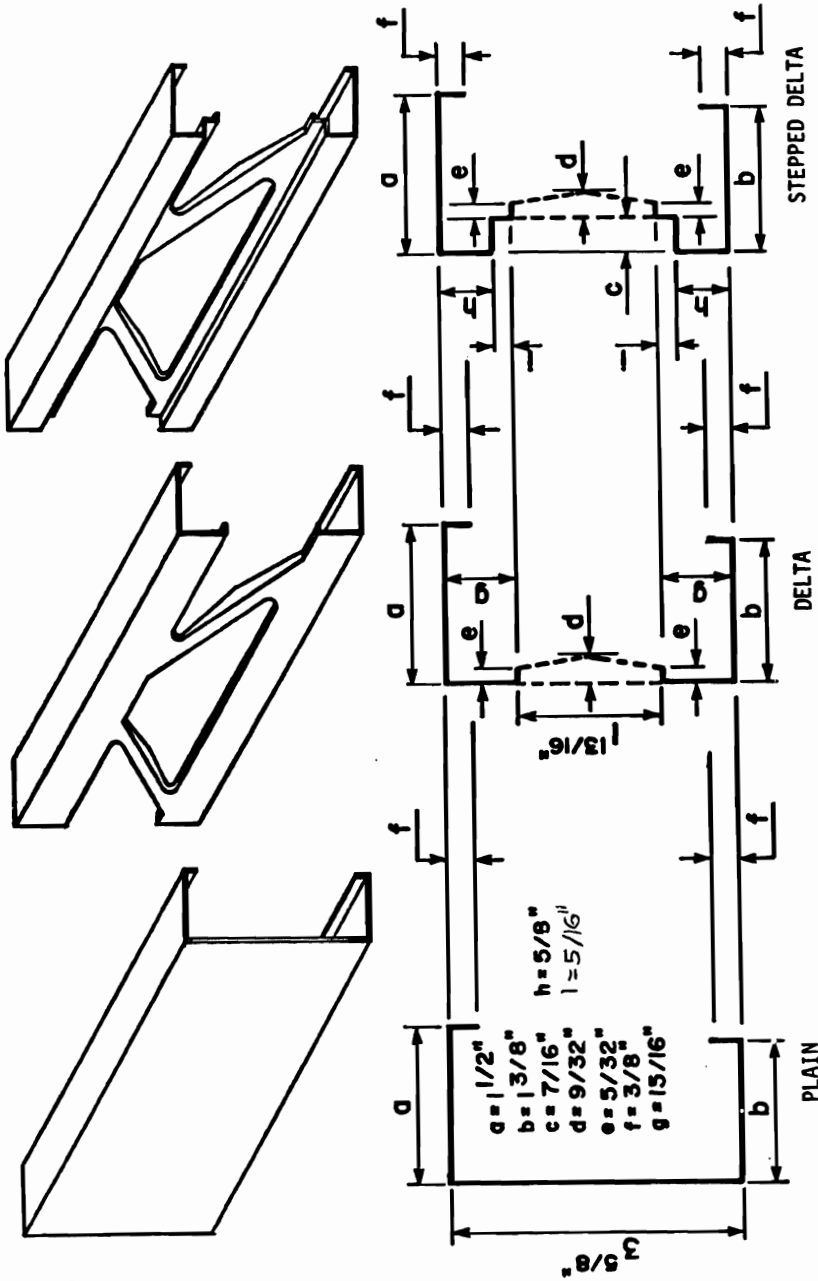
PROTOTYPE COLD FORMED STEEL STUDS INVESTIGATED (NOMINAL DIMENSIONS - ALL INSIDE RADII BETWEEN 1 AND 2t)
